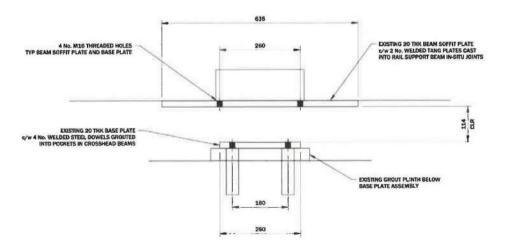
Sketch highlighting typical fixing dimension details – longitudinal section
